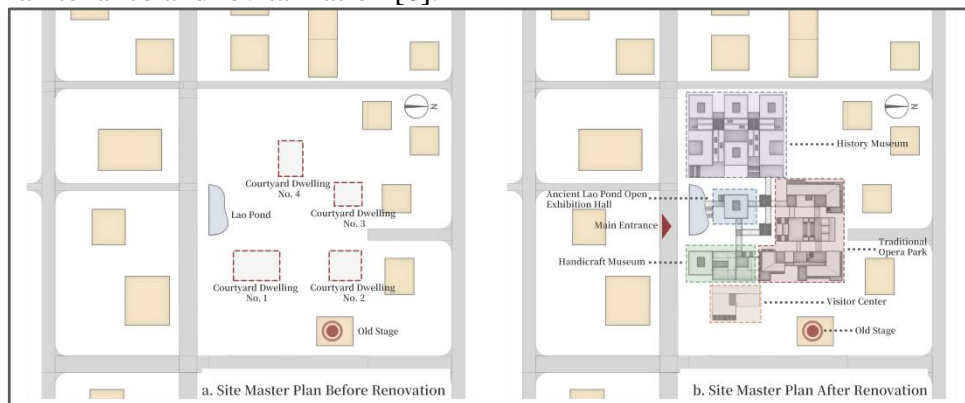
Comparative Site Plans Pre- and Post-Renovation (Source: Hand-drawn)
